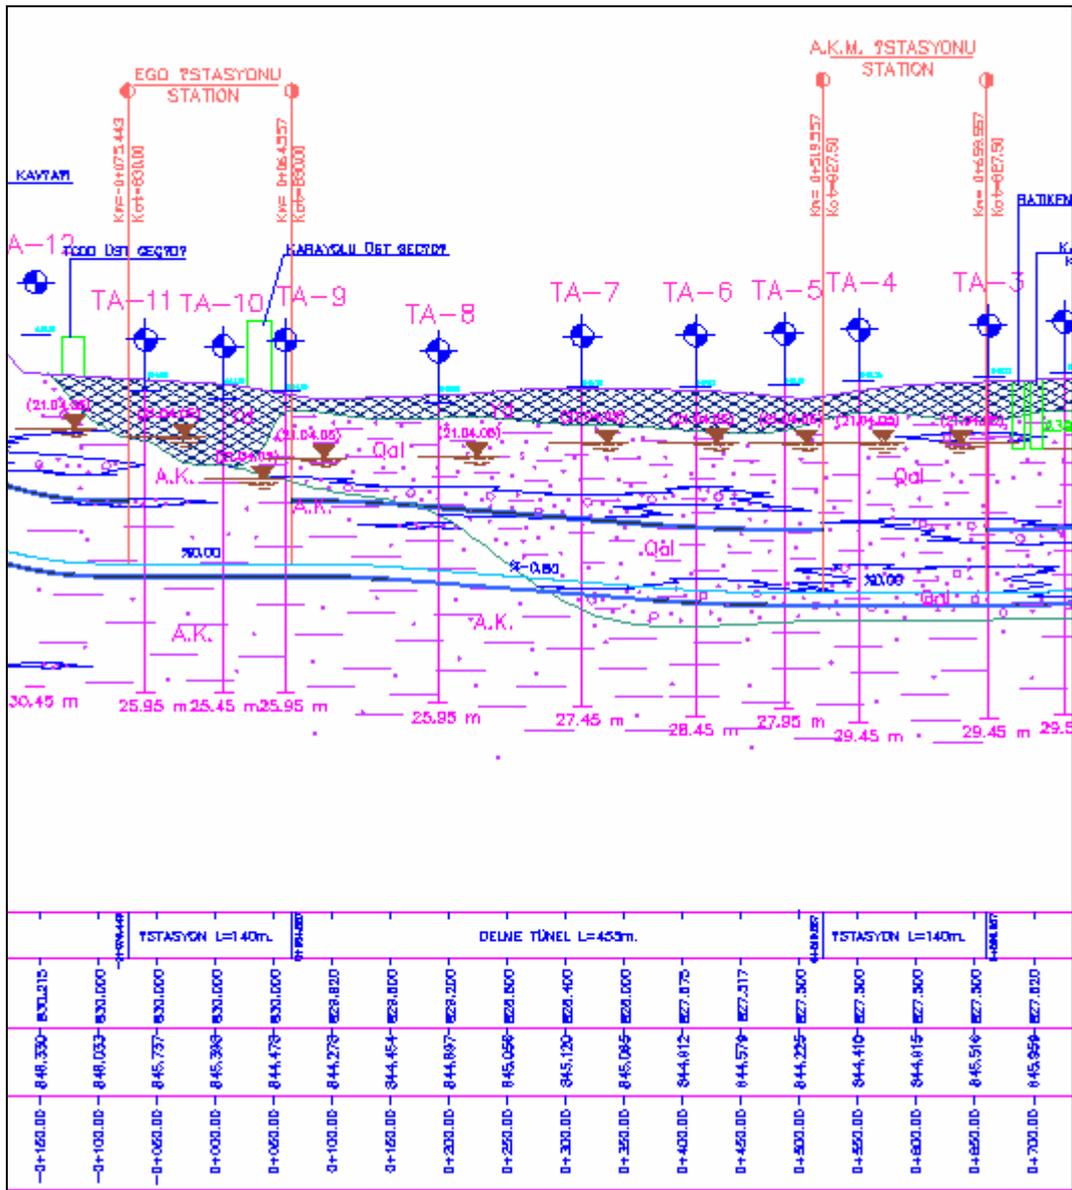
Segment of the metro alignment between EGO and AKM stations
